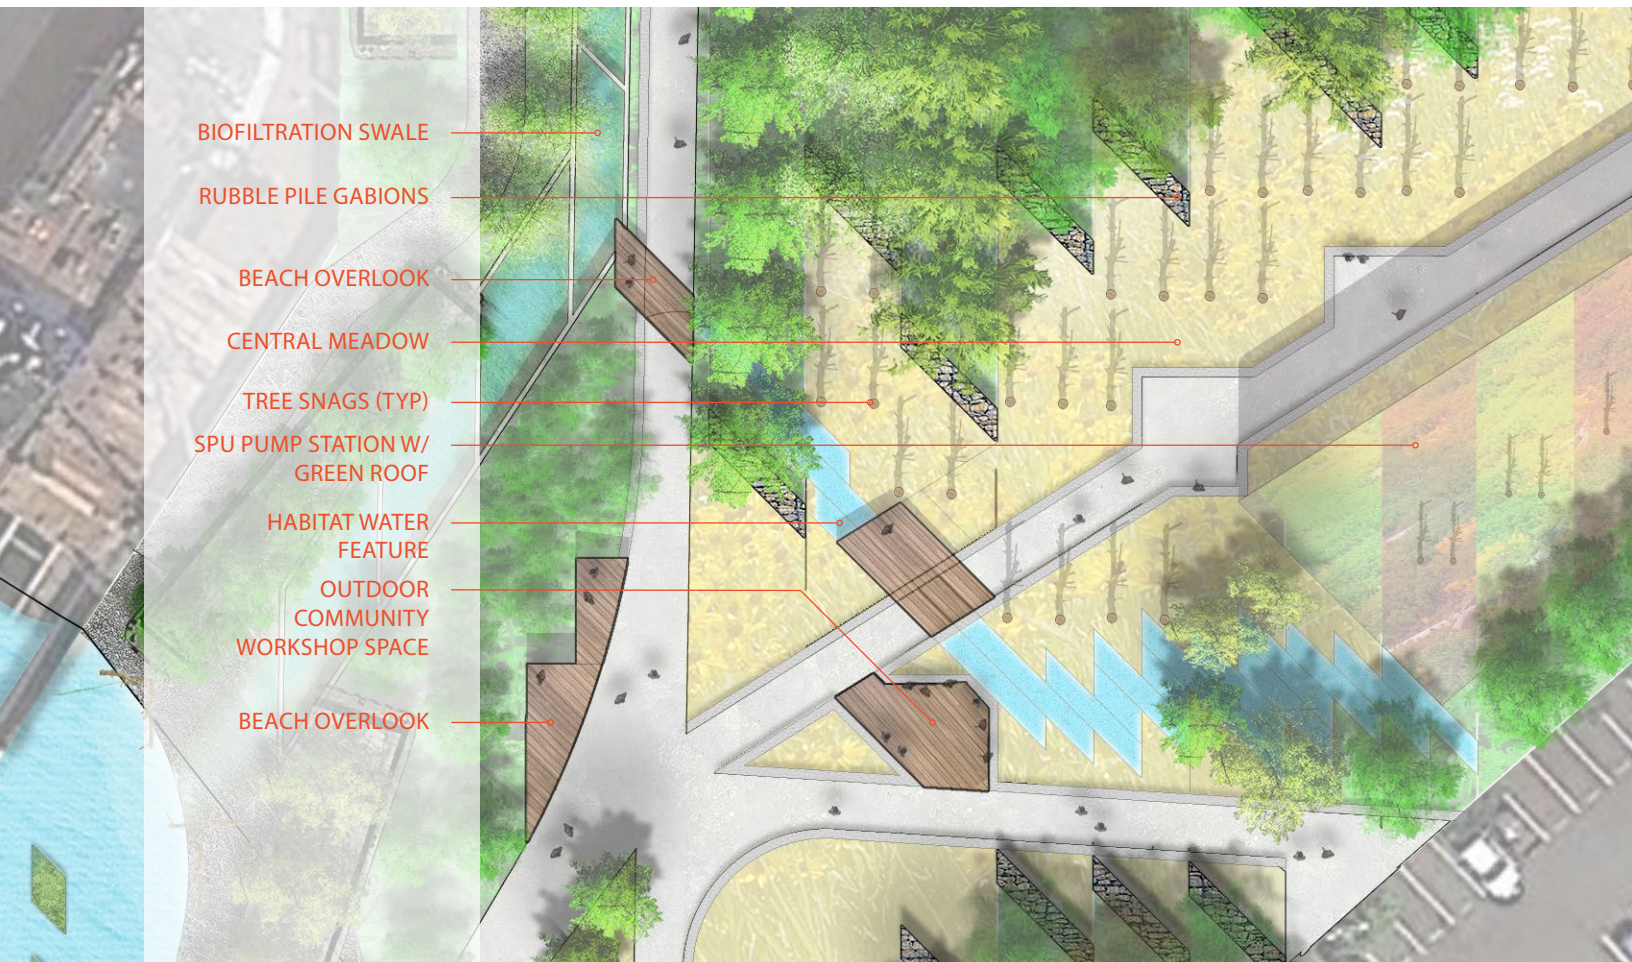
Enlargement of site plan showing biofiltration swale (at left) and wildlife water feature.
